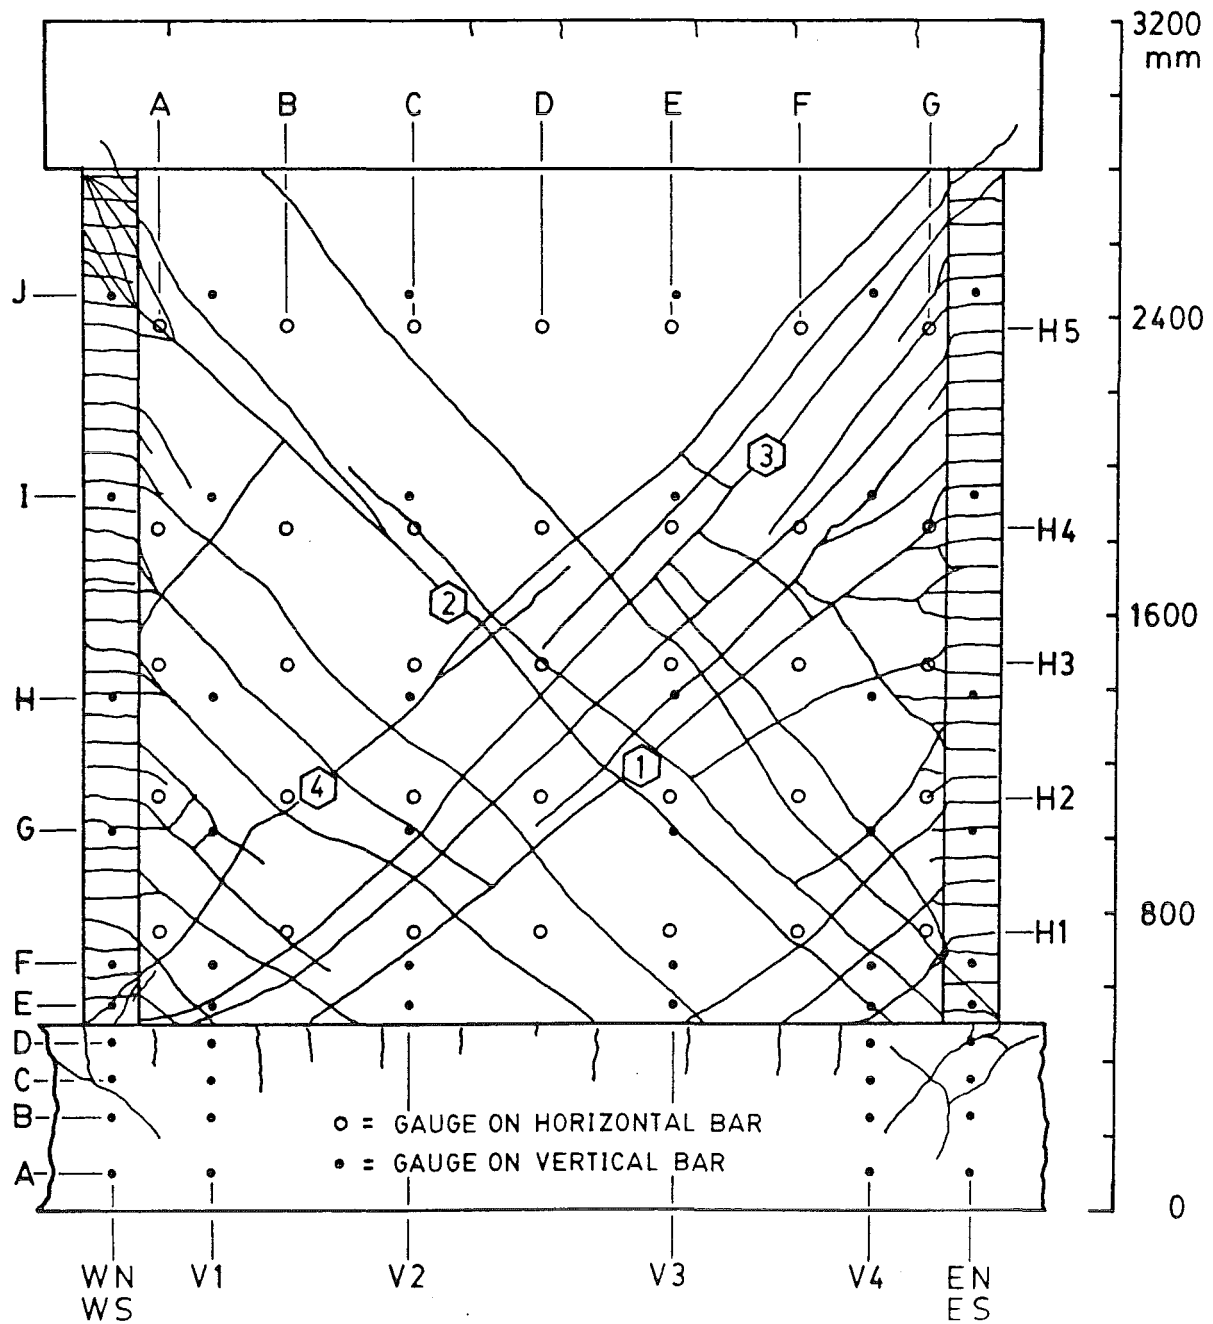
(b) - UNIT 1.0 - Crack pattern at the end of the test
